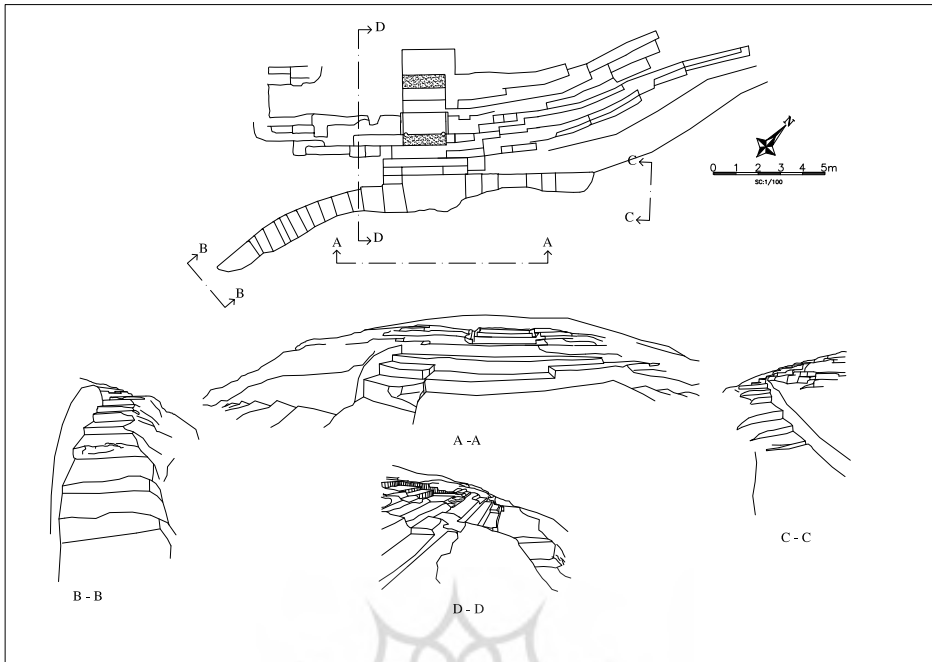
The Picture of Landings and Unfinished Stairs to Top of Mound, Main Stairs
